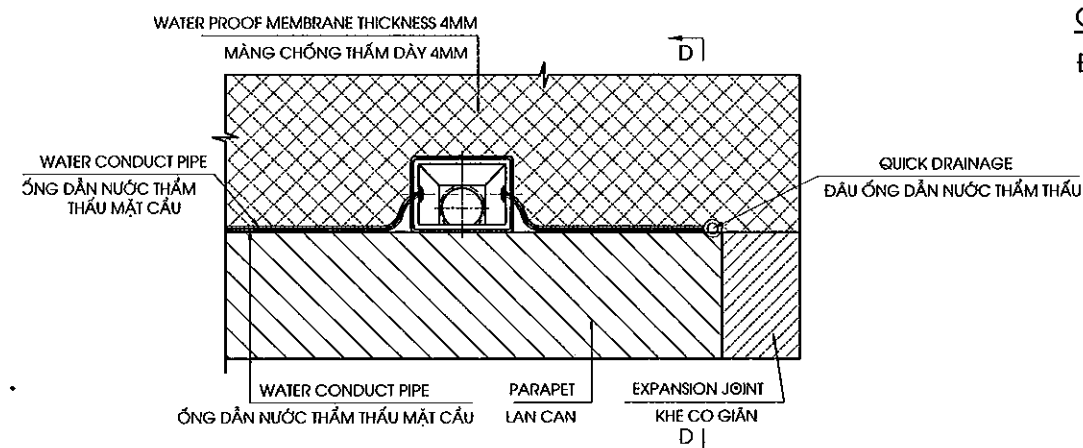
DETAIL WATER CONDUCT PIPE AT EXPANSION JOINT
